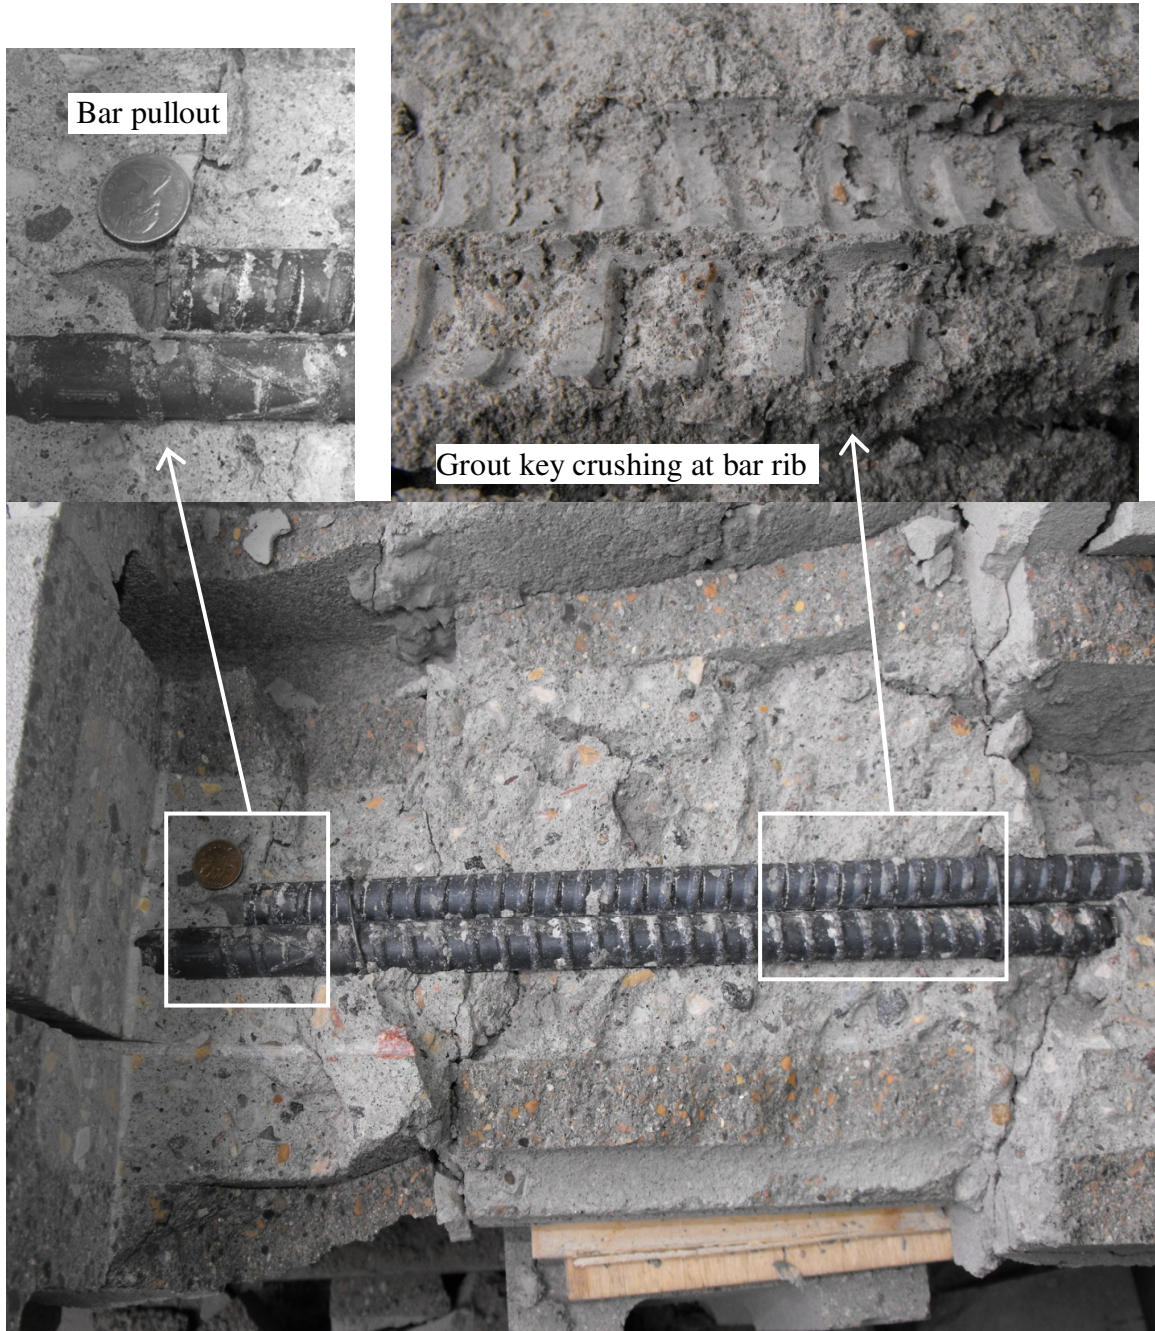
Reinforcing bar pullout and bond deterioration as observed after grout removal – Specimen CW-7.
